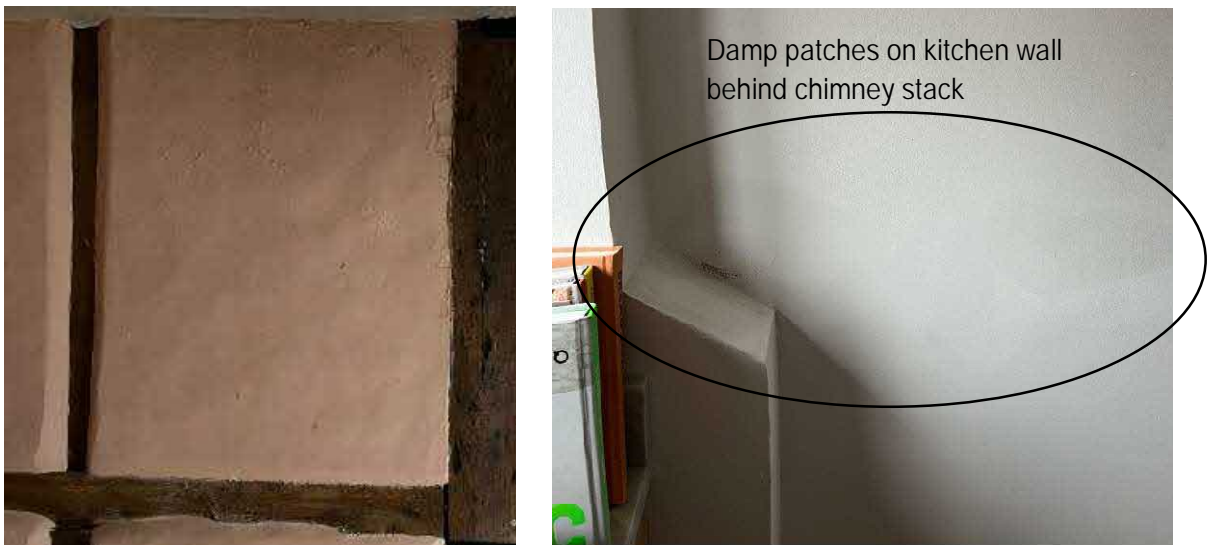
Left – blistering of paint to first floor suggests water ingress. Right – damp patches in kitchen behind chimney stack to the northeast gable.
